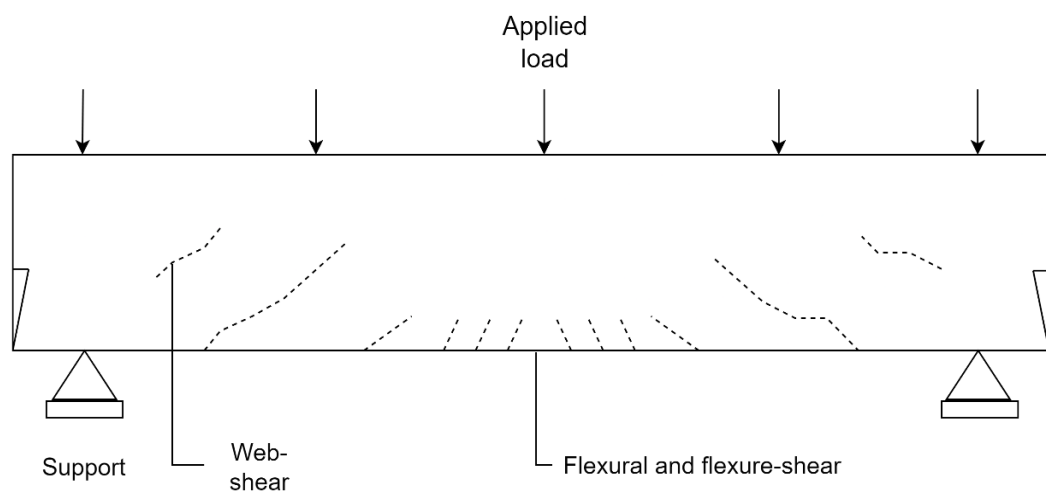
Schematic view of cracks in continuous beam (Doğangün, 2019)
